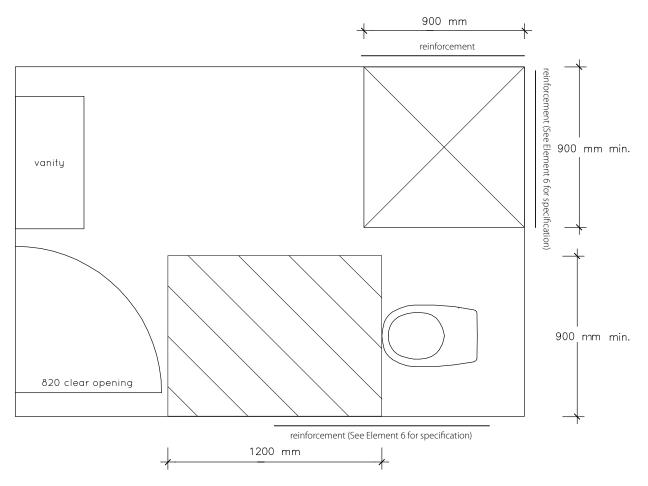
(b) Silver level ground (or entry) level toilet layout and space requirements in a combined bathroom.
